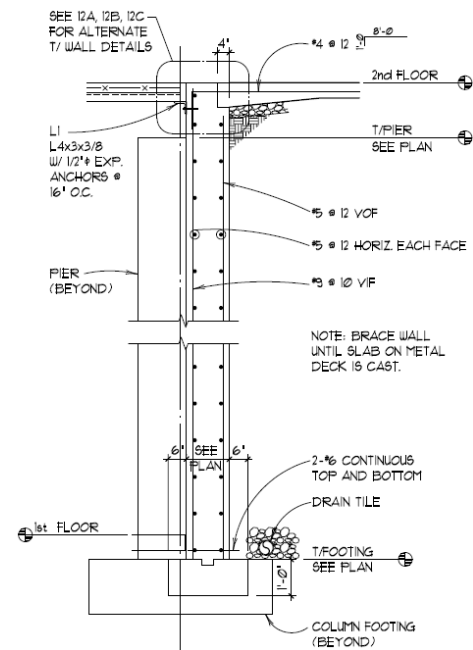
is an actual section, not to scale, of the foundation wall courtesy of the design team
